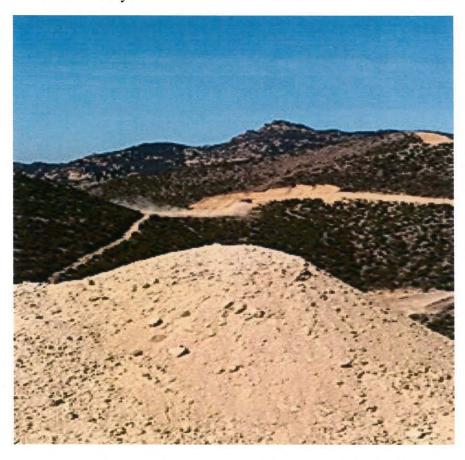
View facing southwest of a filled truck heading toward Devil's Canyon.
